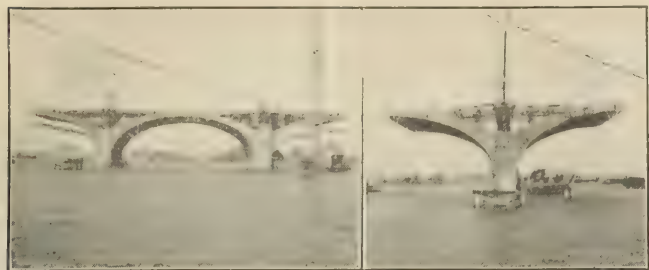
TWO ADJOINING DOUBLE CANTILEVERS
